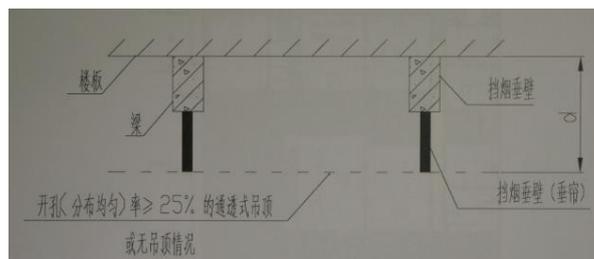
(a) No hung ceilings or set transparent hung ceilings (even-distributed aperture ratio $\geq 25\%$).
